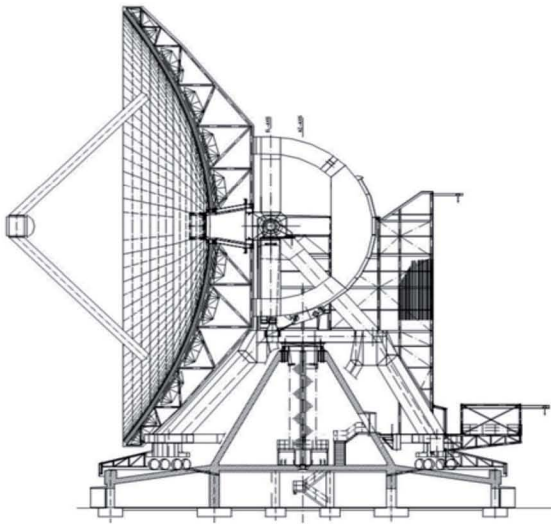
A cross-section drawing of the Large Millimeter Telescope (LMT).
